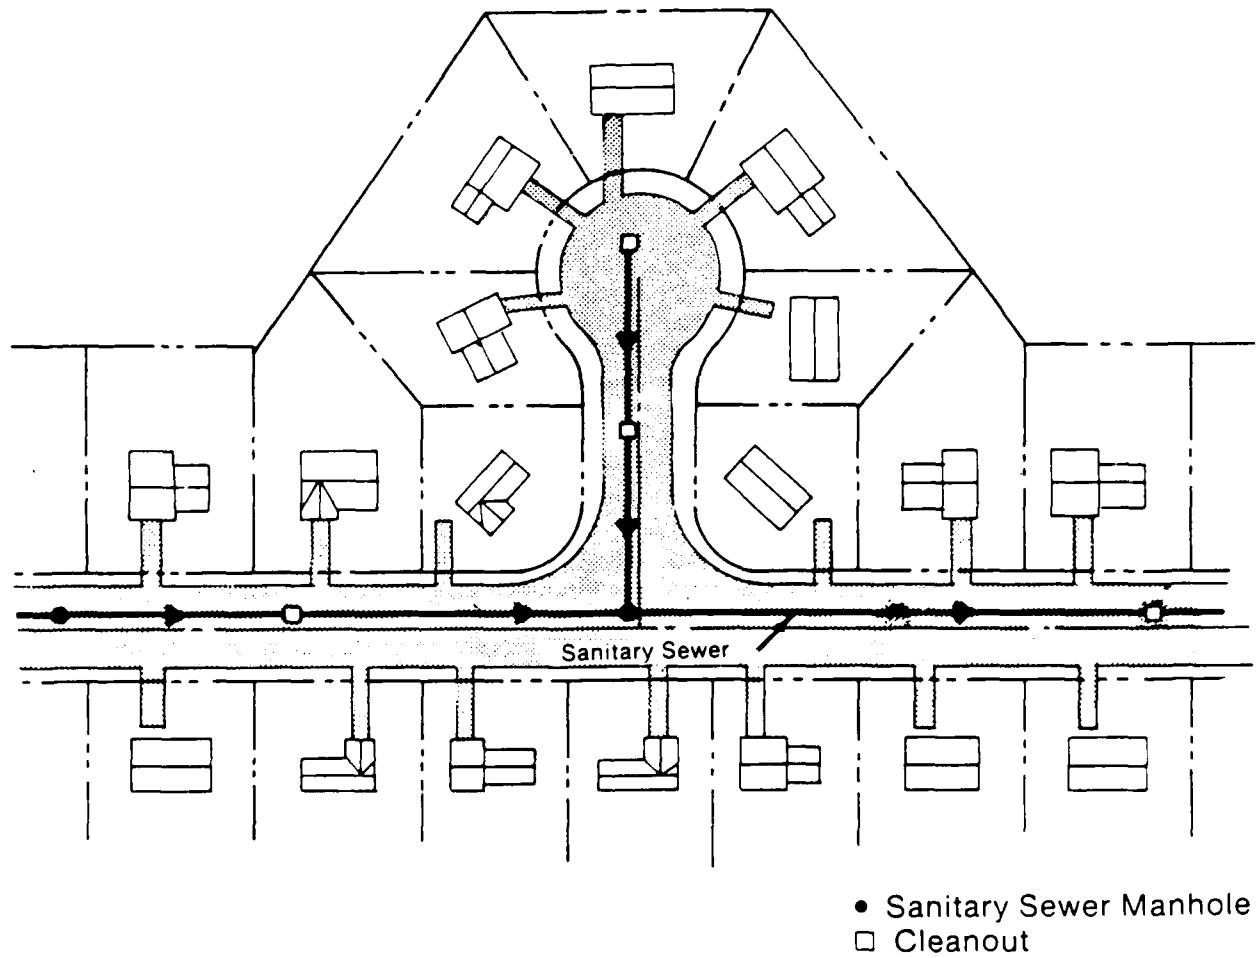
Typical Sanitary Sewer Lines With Cleanouts. (From Innovative Site Utility Installations, HUD.)
